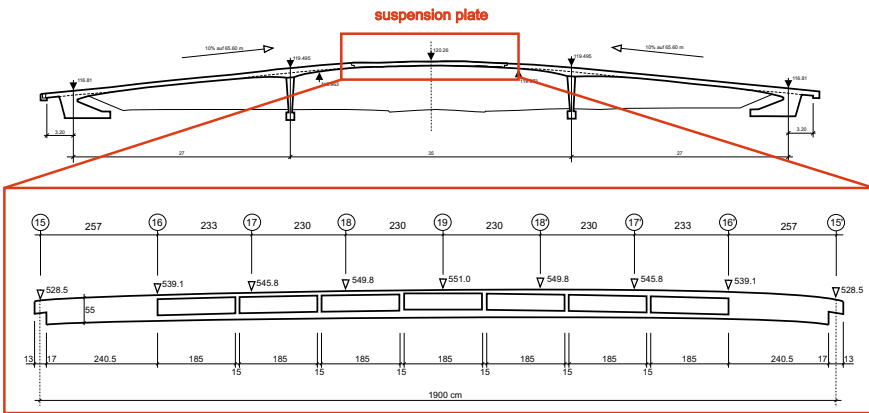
top: View of the bridge; bottom: Longitudinal section of the suspension plate
